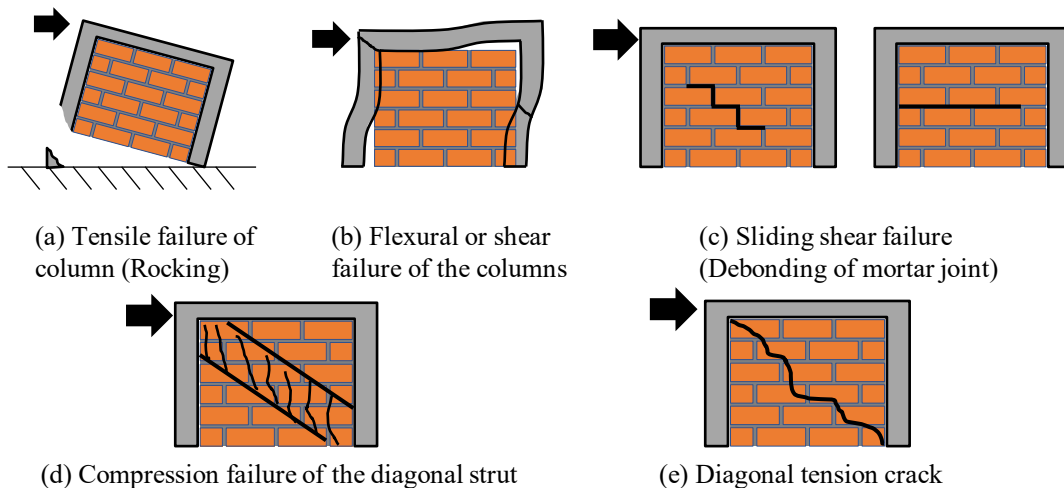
Failure mode of the masonry infilled frame.
